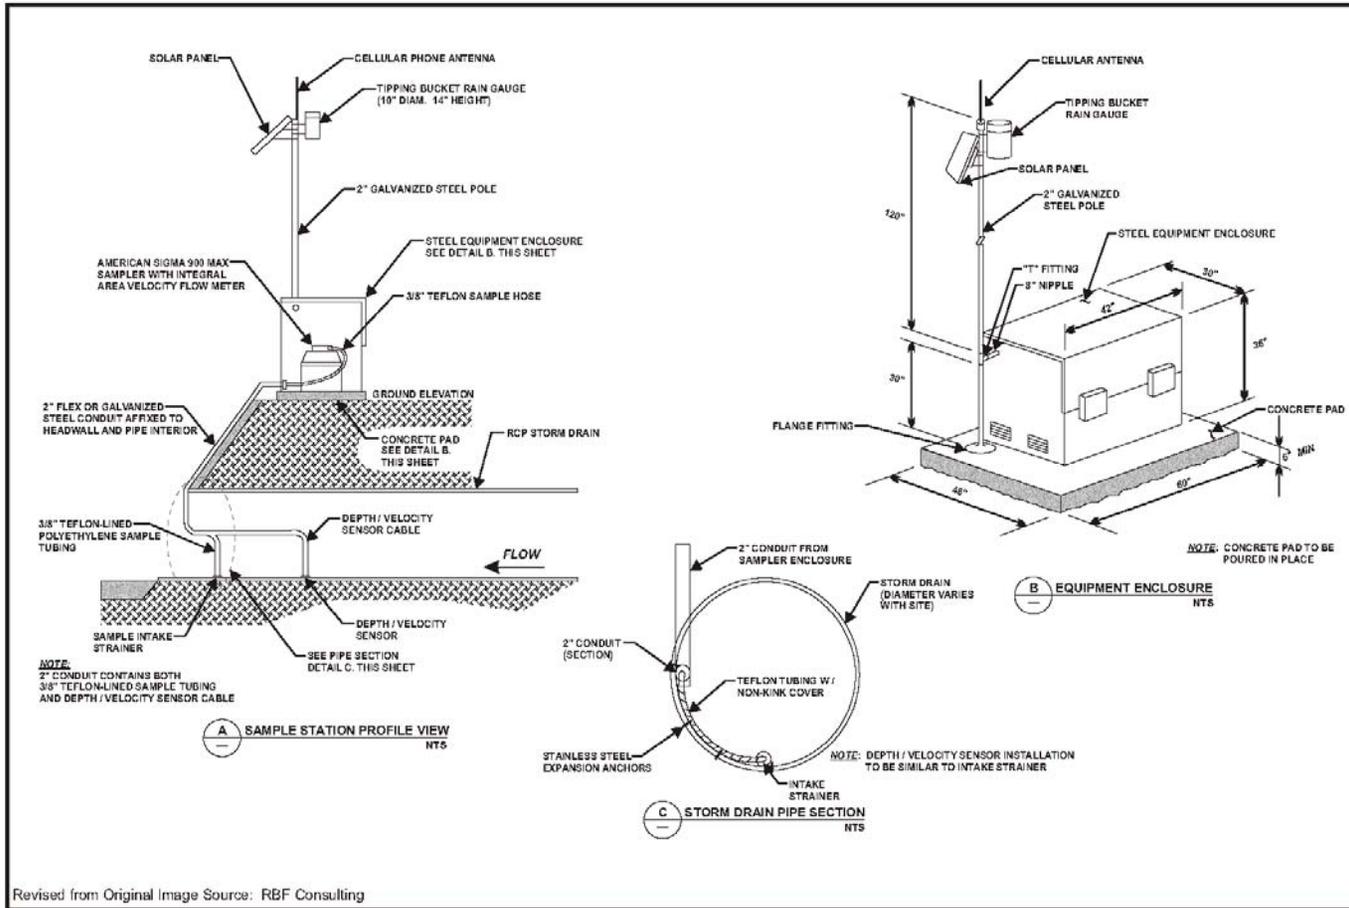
Typical KCLASS Stormwater Monitoring Station.
